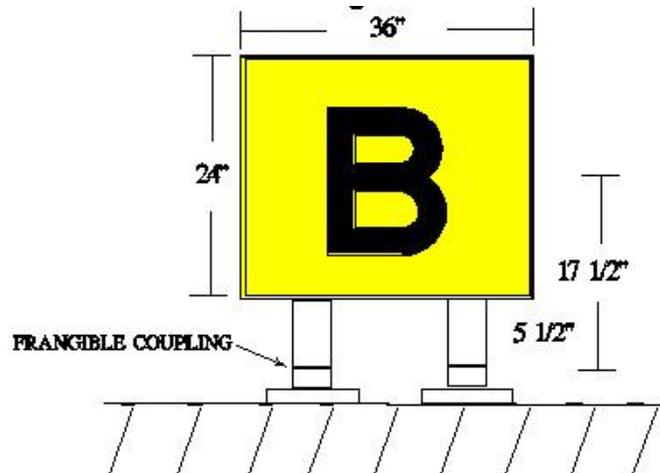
DIMENSIONS OF A SIZE-2, SINGLE-PANEL SIGN
